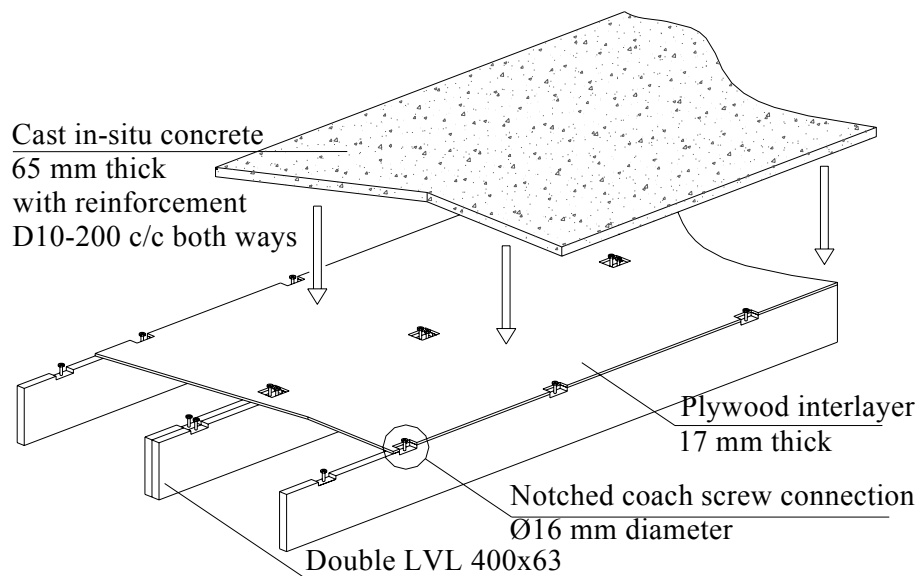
Proposed semi-prefabricated LVL-concrete composite system
